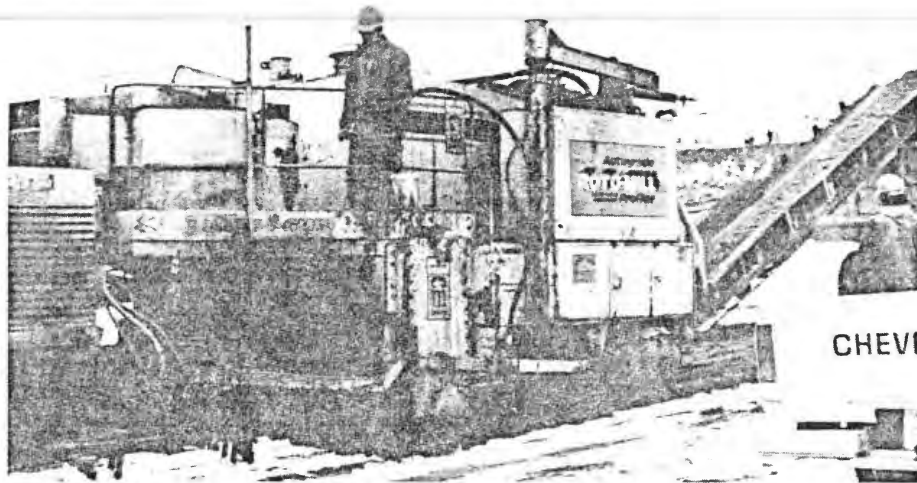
Roto-Mill profiler used for excavation of the foundation for the labyrinth spillway.
